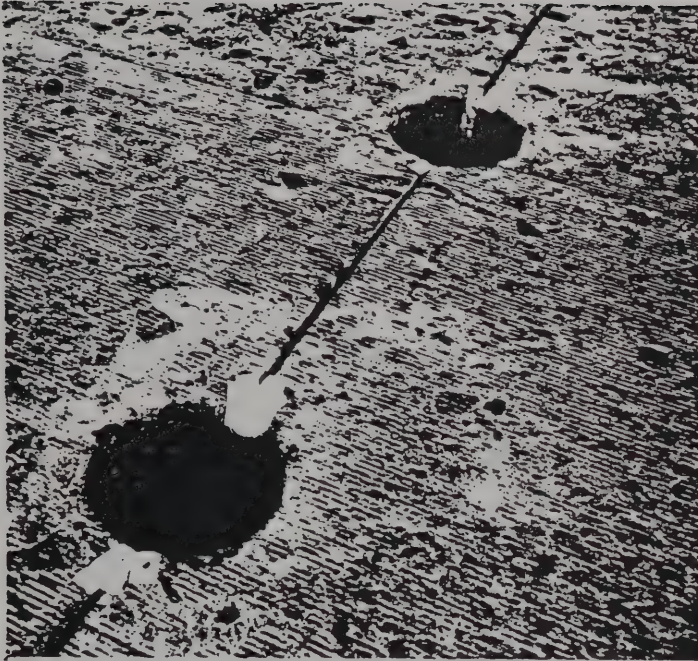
Masking Tape Sealing The Crack, And Primer Applied To Core Hole Walls
